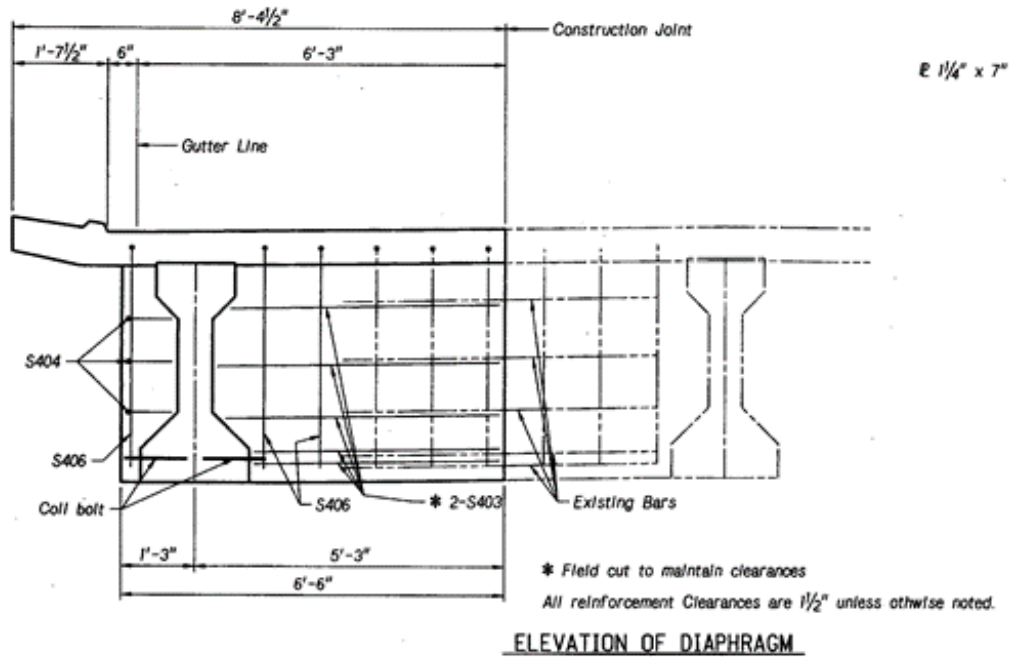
Girder replacement procedure, splicing diaphragm reinforcement, from the replacement documents of York East Bridge, courtesy of NDOT
